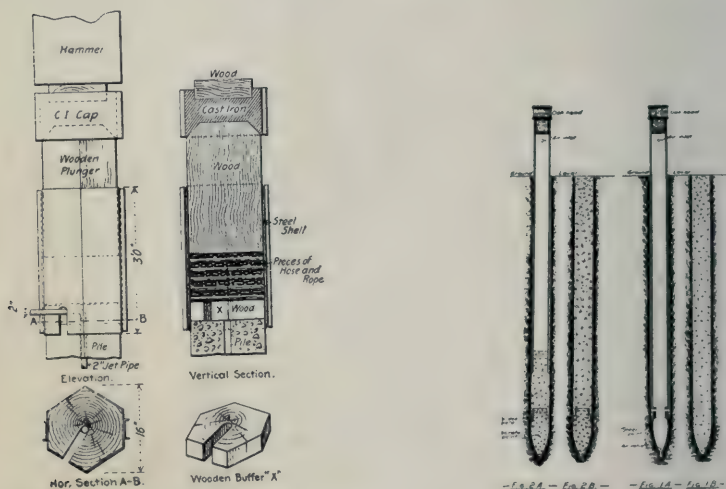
Cushion cap used in driving the corrugated concrete pile.
